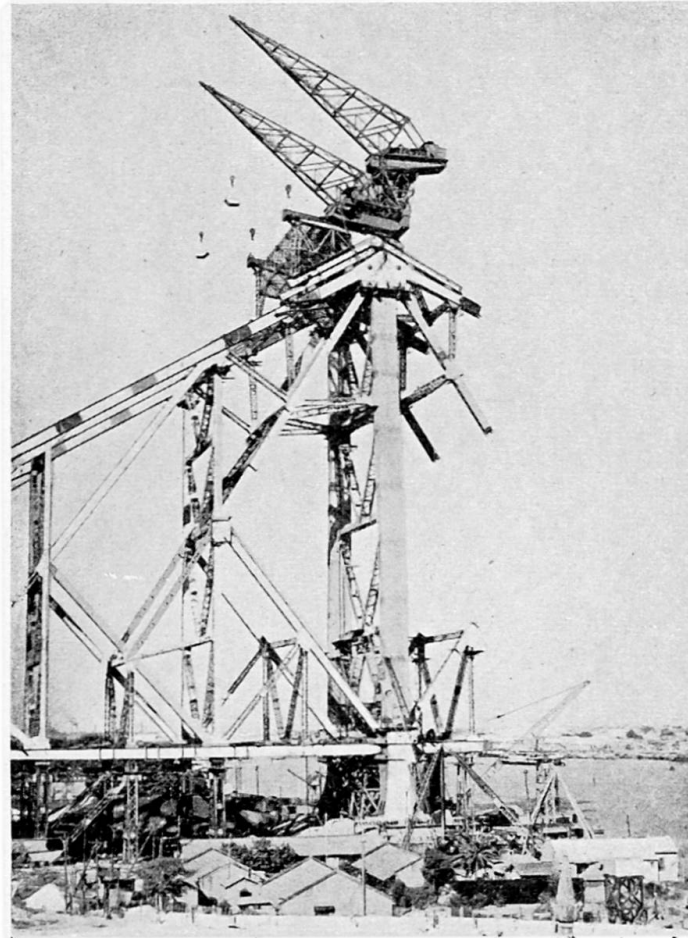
New Howrah Bridge, Calcutta. Creeper crane moving off temporary cradle on which it had been hoisted up anchor arm on to fleeting tracks on cantilever arm
